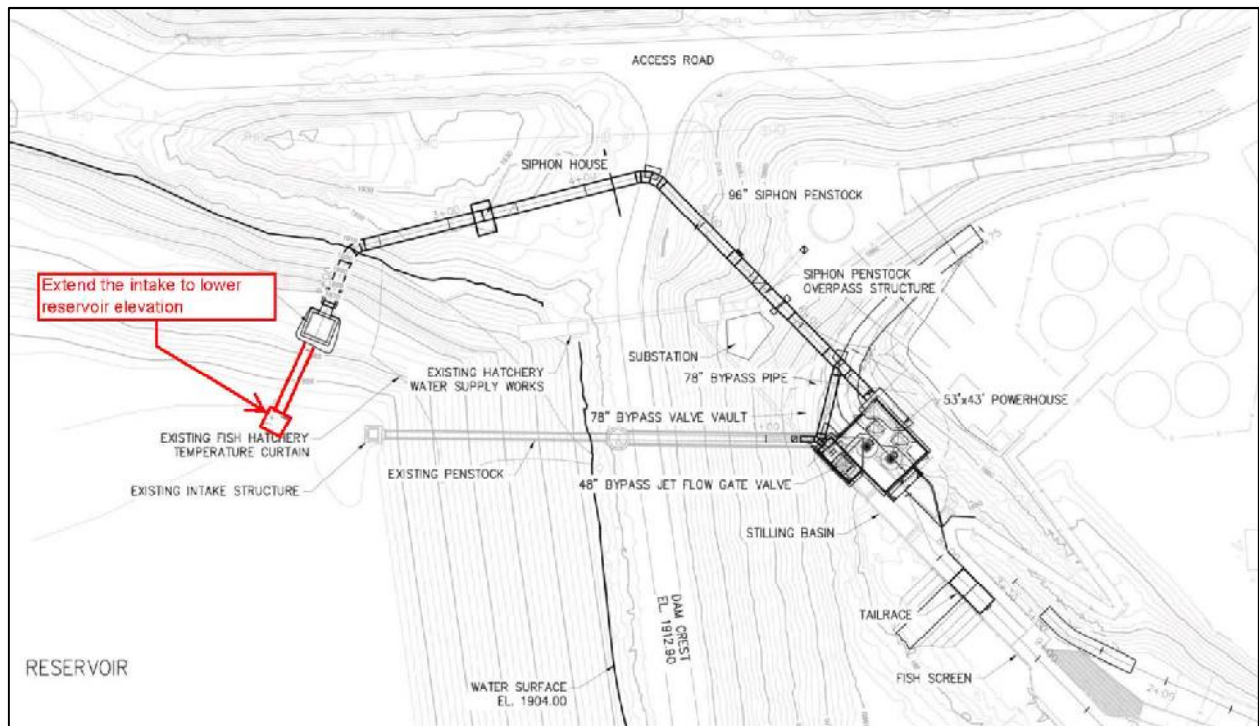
Modification of Lewiston Powerplant Intake - Plan.
